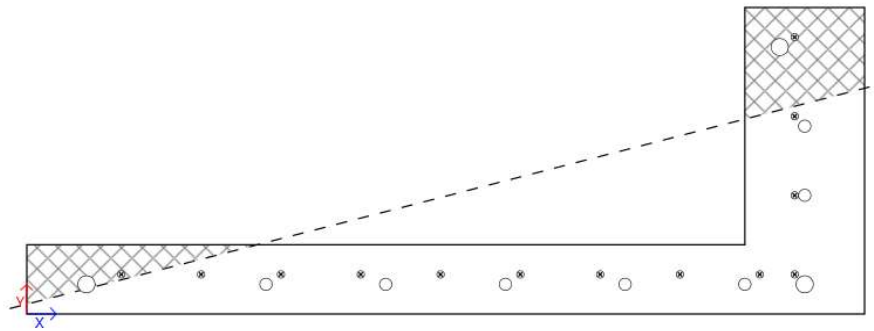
Reinforcement Locations of Strand (Left) and Rebar (Right)
